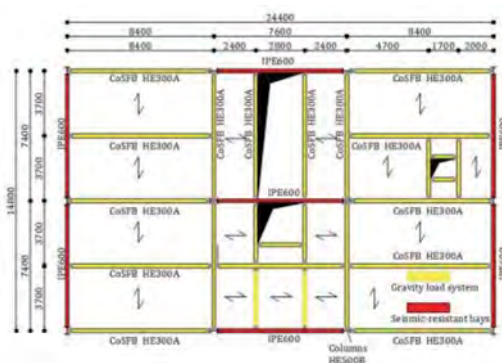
Floor layout of the structure of the building [DREAMERS (2021 – 2025)].
